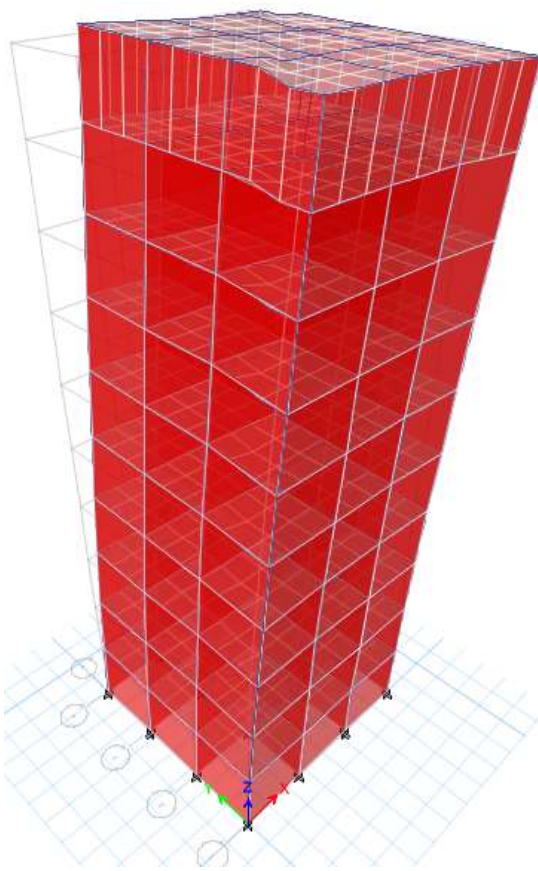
Deformed Shape of Filled Elevated Water tank due Load Combination of 1.2 (DL+EQL+WP)
